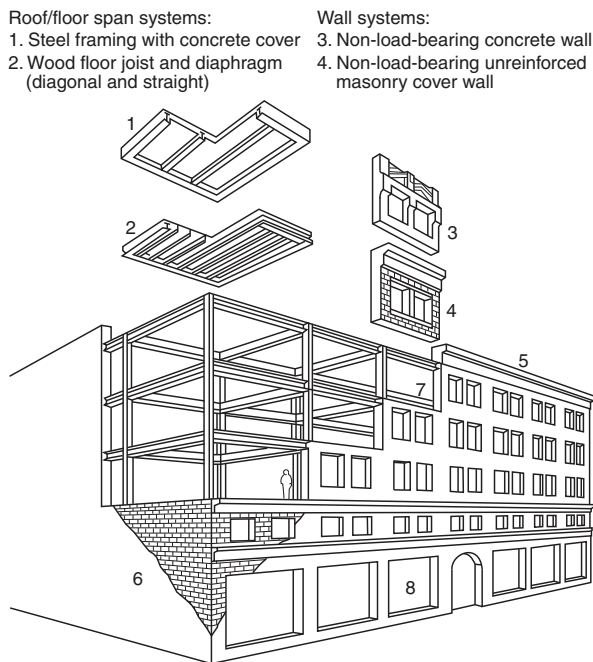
(g) Steel Frame with Unreinforced Masonry (URM) In-Fill.
